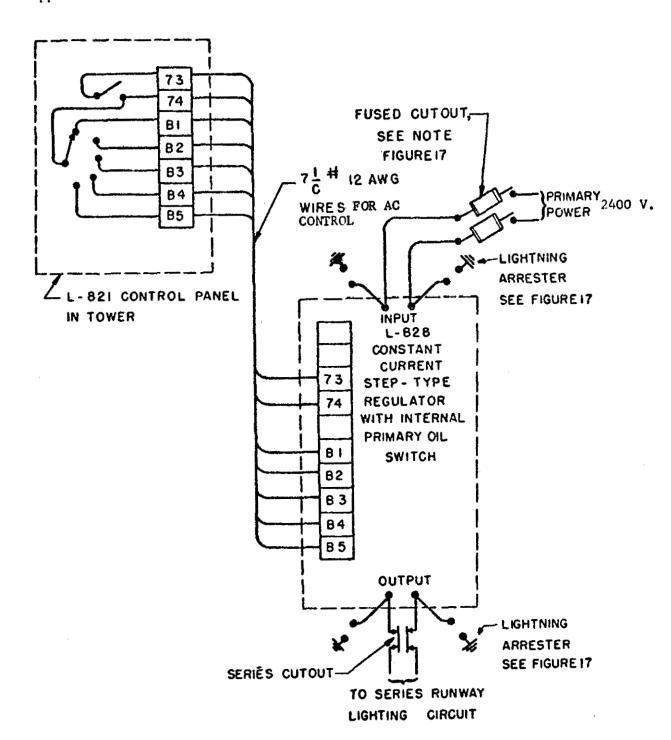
TYPICAL HIRL WIRING DIAGRAM UTILIZING L-828 STEP-TYPE
